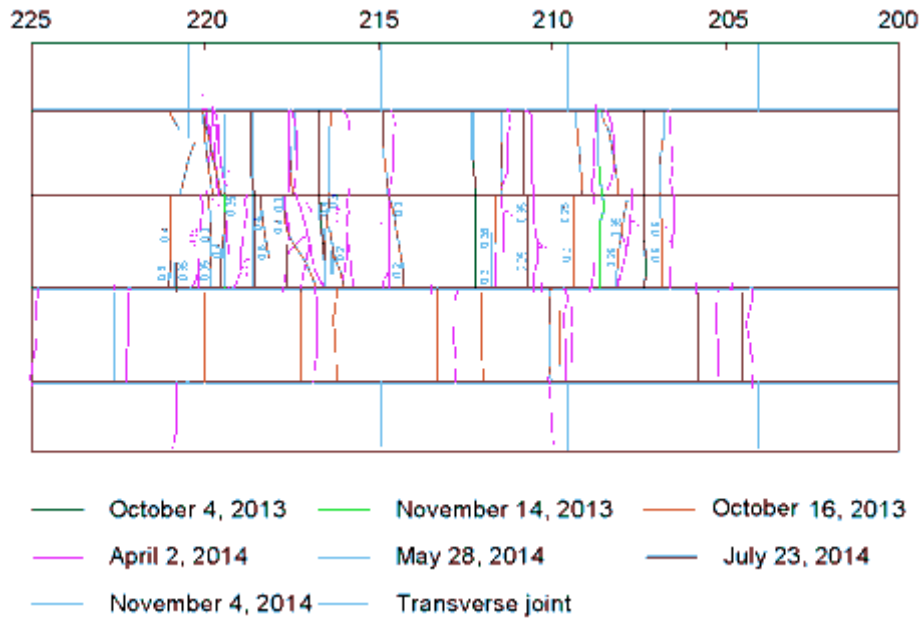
Cracks in concrete slab, section 200 to 225 (GFRP)
